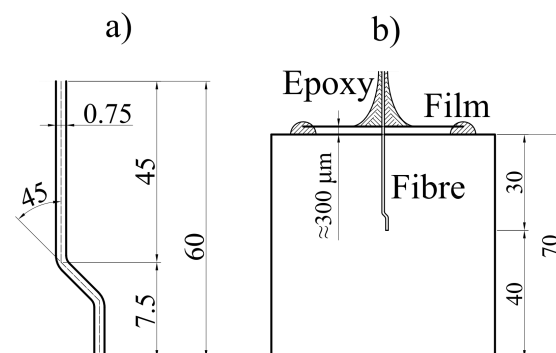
Dimensions of a) steel fibre and b) pull-out specimen. Dimensions are expressed in mm. After [9].
